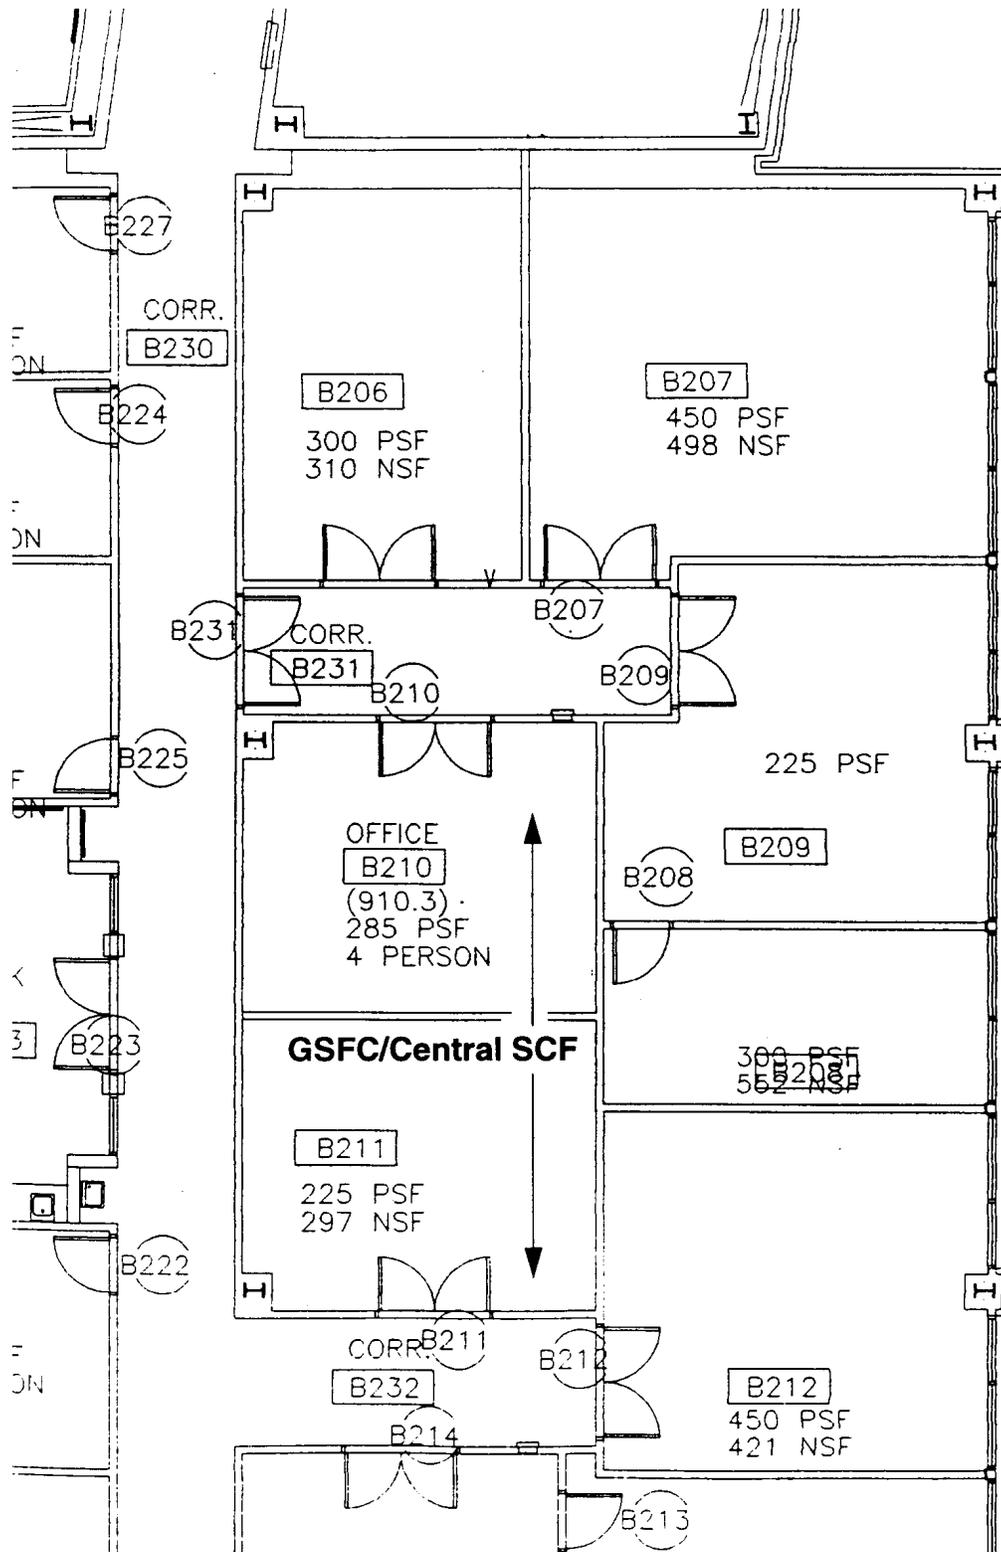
Building 33 Floor Plan for the GSFC/Central Node of GLAS SCF
